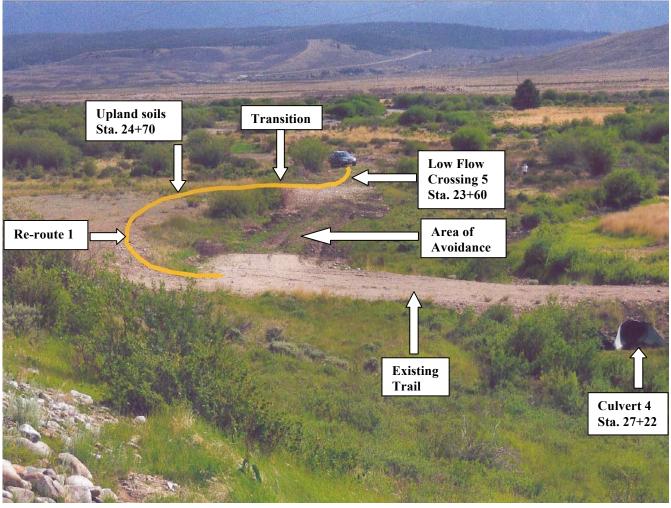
illustrates the proposed re-route around the saturated soils exposed by deconstruction of the EPA haul road. The proposed treatment for the area passing over the upland soils would be the addition of a 4' wide by 4" thick on-grade application of compacted $\frac{3}{4}$ " minus road base, to distinguish the trail from its surroundings, and to elevate the trail tread above ground level surface flows and allow it to shed water. Drainage on the 4' wide trail tread will be accomplished by cross sloping the trail tread to the down slope side. Cross sloping will be at a minimum 2% grade, but in no circumstance will exceed 5%.
